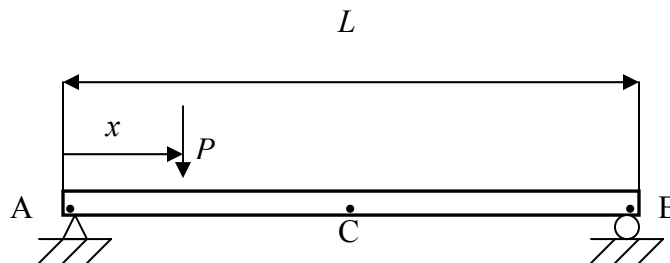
Simply supported beam with point load representing a single span bridge with axle loading.
